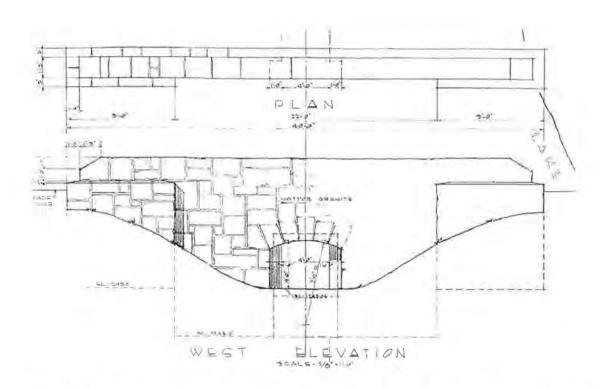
Detail of the bridge construction plans. The sheet was signed by officials from the state highway department, NPS, and Minnesota Department of Conservation in August 1938. A second plan sheet with revisions was signed in December 1938 and January 1939 (drawn by H. O. Skooglun of the NPS; Site Development Unit, MnDOT, St. Paul).
